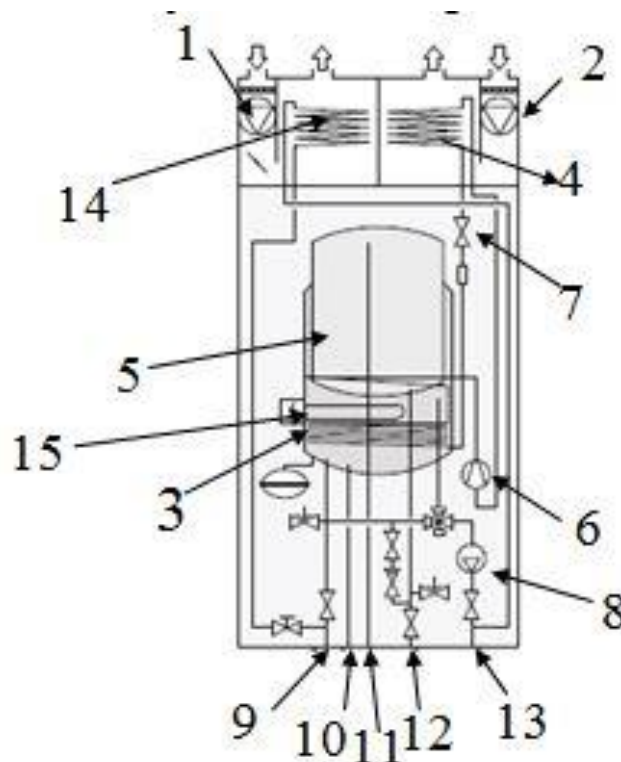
Main parts of NIBE F470 (1 - outdoors air duct + supply fan, 2 - exhaust air duct + extract fan, 3 – condenser, 4 – evaporator, 5 – storage tank, 6 – compressor, 7 – expansion valve, 8 – circulation pump, 9 – heating return pipe, 10 – docking connection, 11 – hot water pipe, 12 – cold water pipe, 13 – heating supply pipe, 14 – supply air battery, 15 – immersion heater /7./
